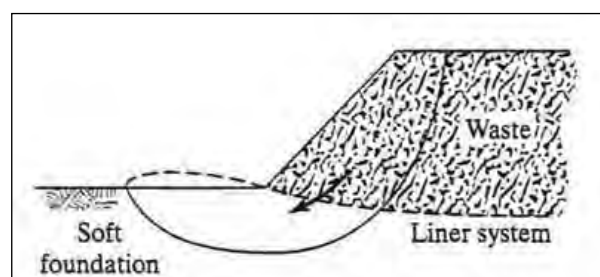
Rotational failure through waste mass, liner and foundation soil
